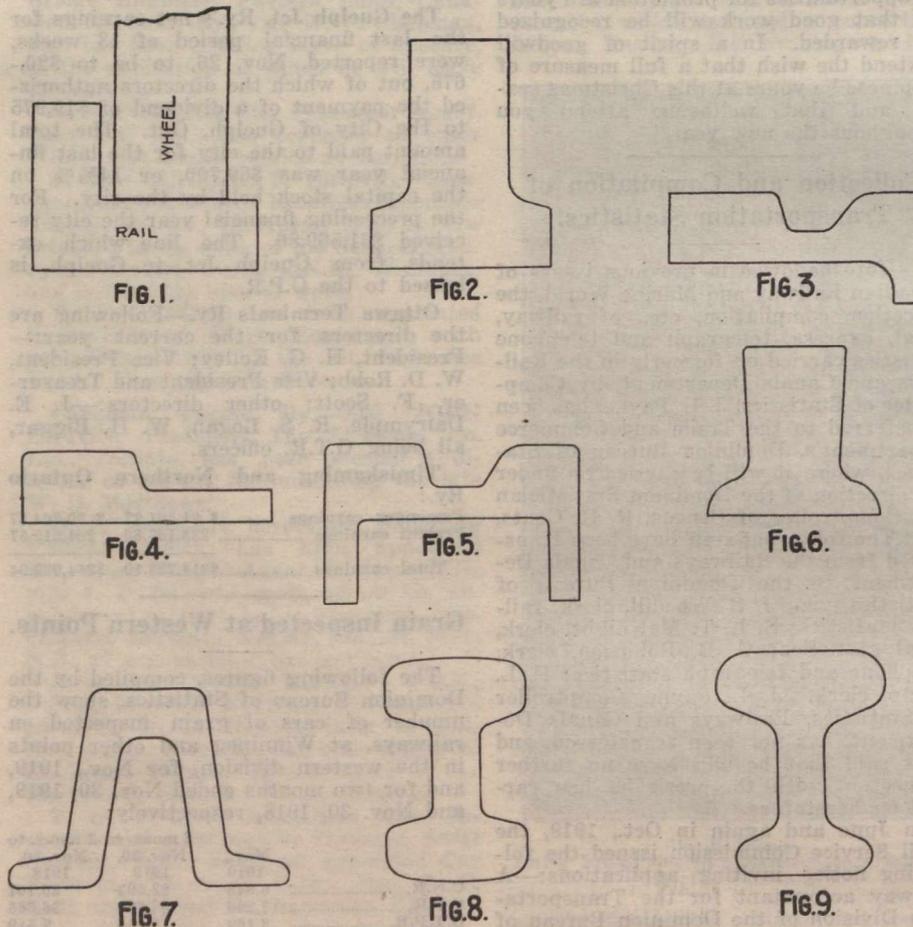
Plate rail, 1767, cast iron. Fig. 4. Stringer rail without groove. Fig. 7. Bridge rail, 1837, 92 lb.
